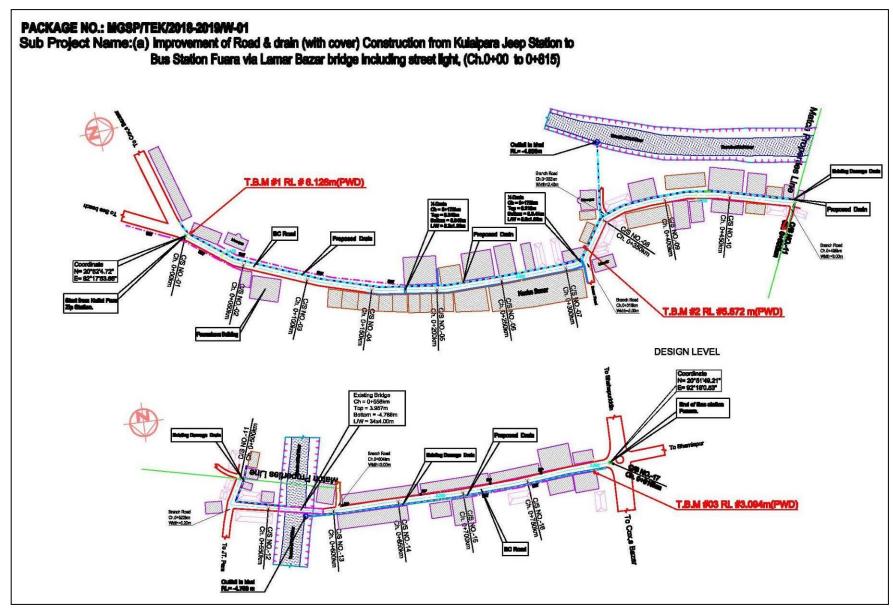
(a): Layout Plan for the proposed Subproject (a) Kulalpara Jeep Station to Bus Station Fuara via Lamar Bazar bridge road
